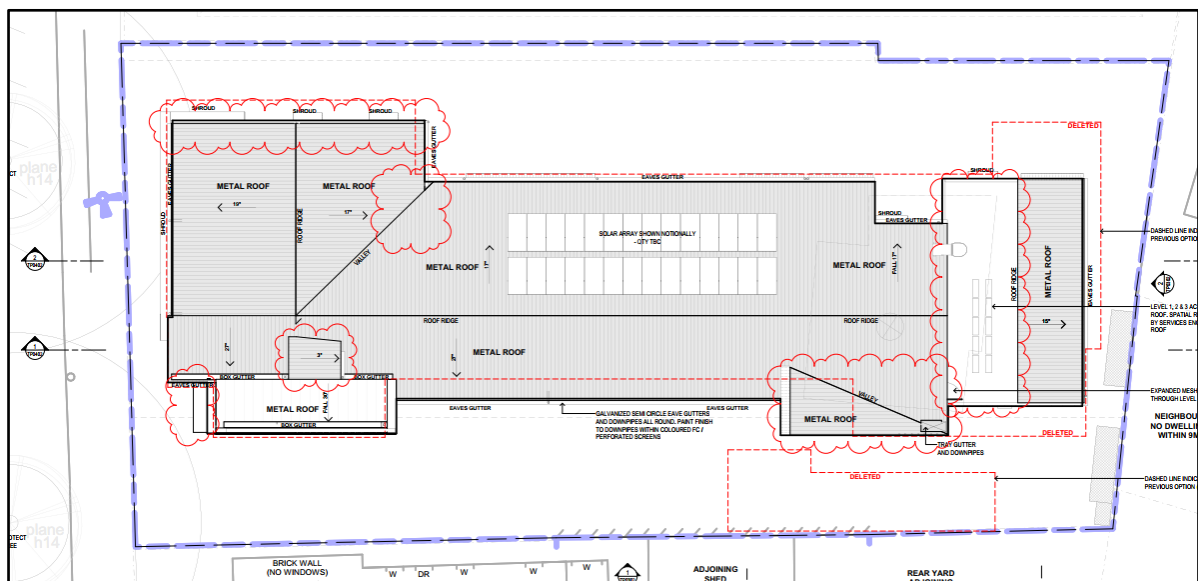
Roof Plan showing increased setbacks from earlier proposal (in red)
